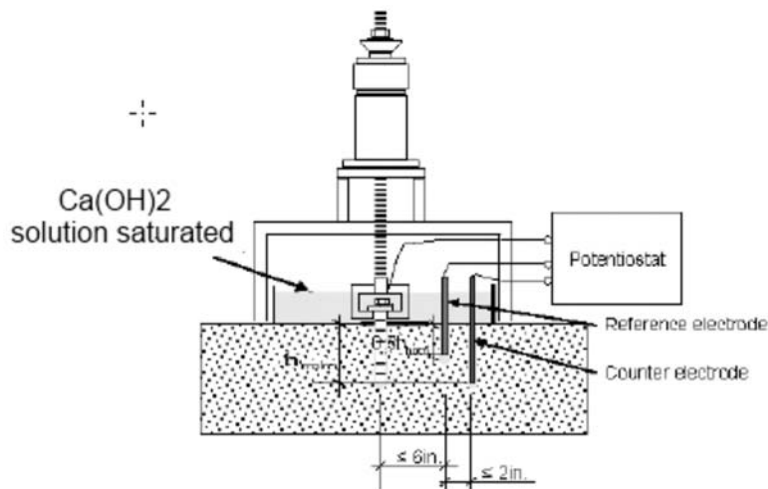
Example of Unconfined Test Setup with Bevel Washer Under Anchor Head for Checking Brittleness of Concrete Screws (Alternate Test Method A)
